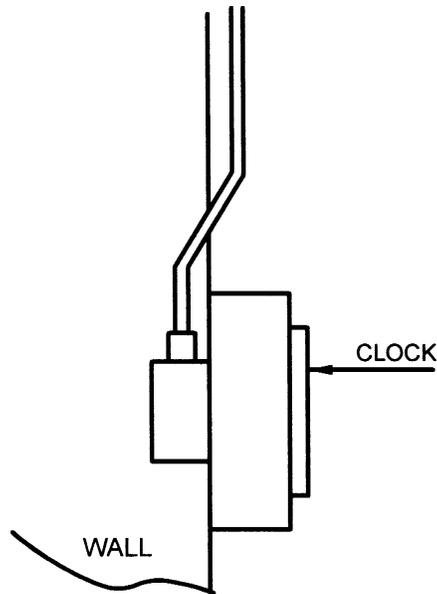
SURFACE CONDUIT SYSTEM WHEN FITTING/ ACCESSORY MUST BE FLUSH ON WALL OR CEILING
